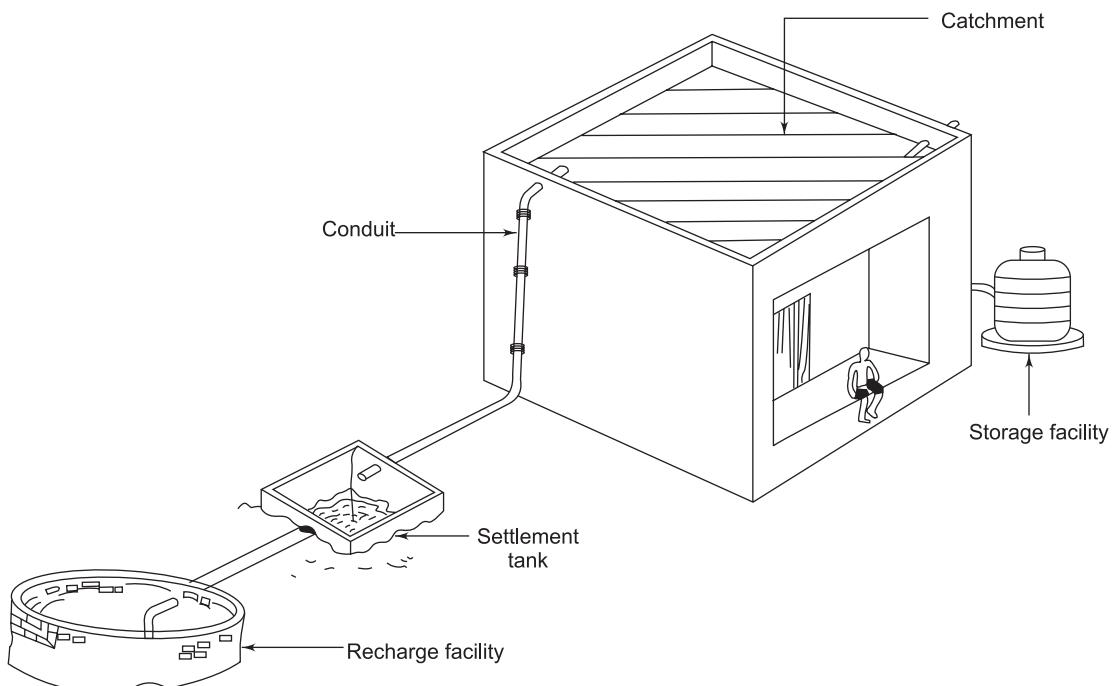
Typical Rainwater Harvesting Facility for a Building
